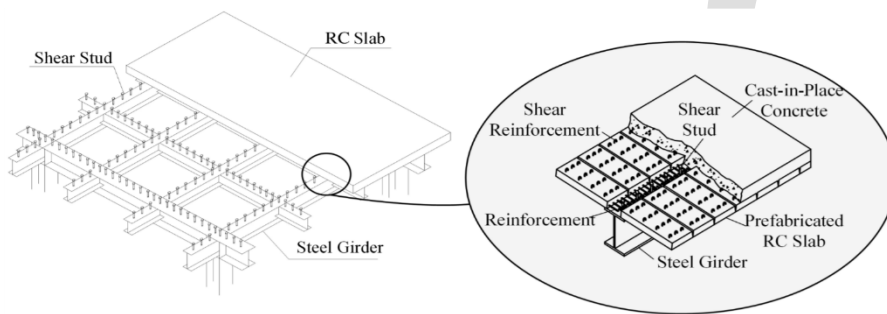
Isometric view of two-way steel-concrete composite slab [8]
